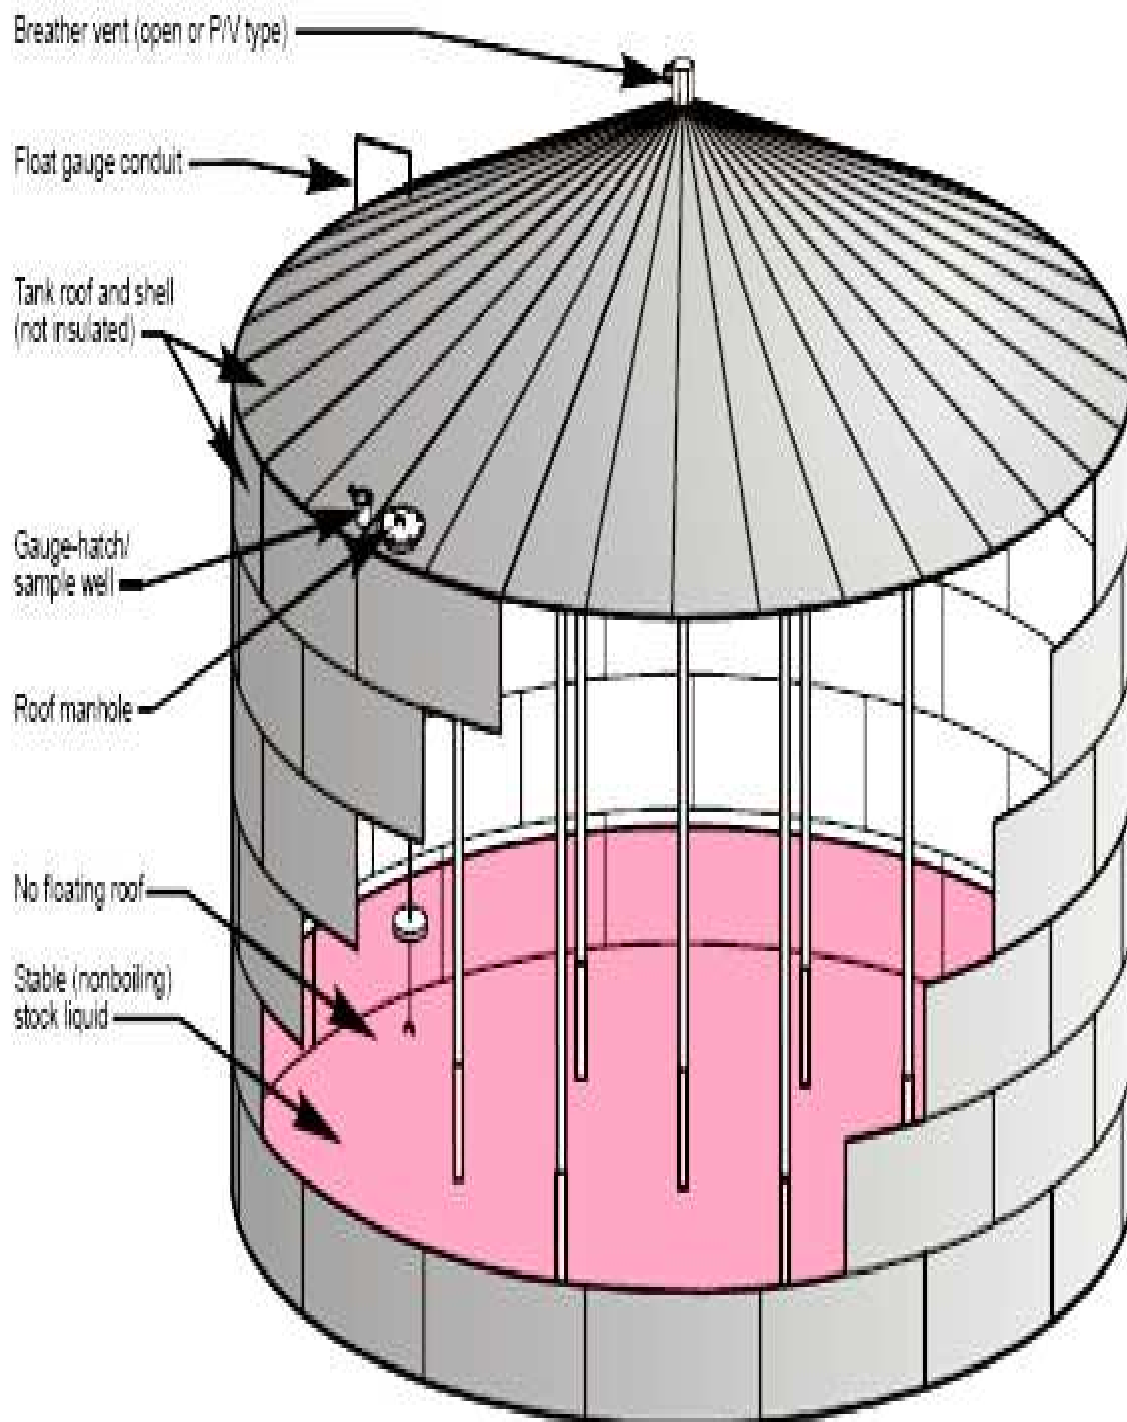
Fixed Roof Tank (From AP-42, Section 7.1, U.S. EPA)
